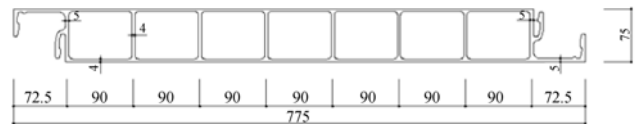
GFRP composite deck with snap-fit connection (Lee and Hong, 2009)
